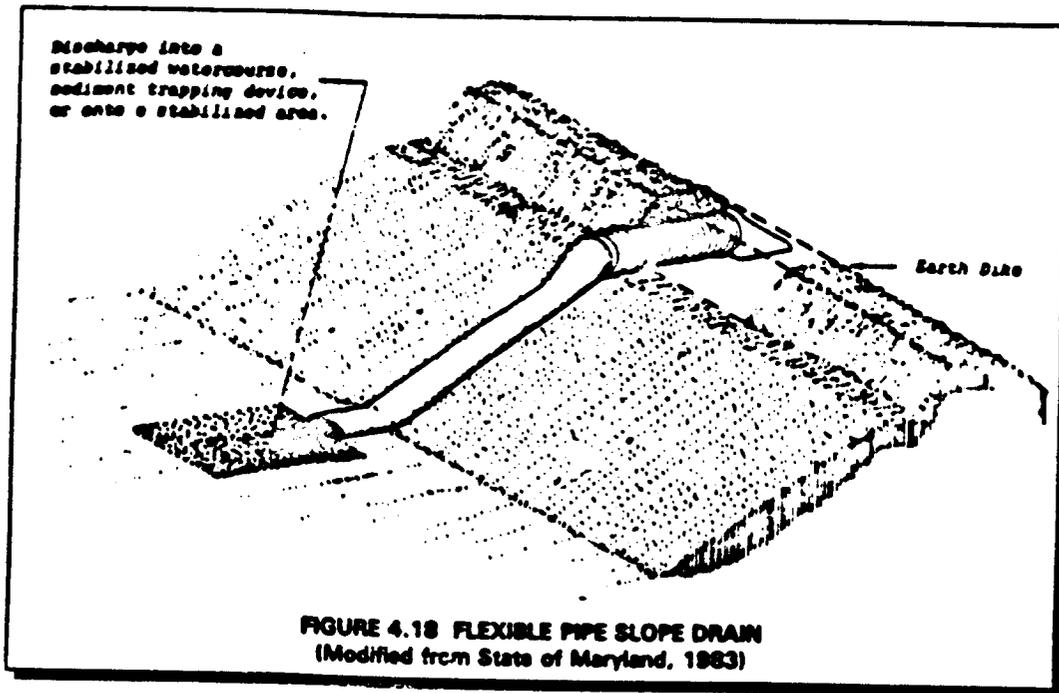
FLEXIBLE PIPE SLOPE DRAIN
